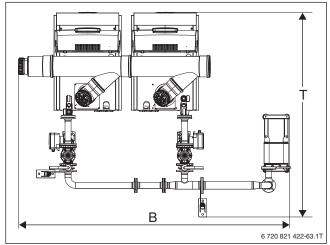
2-boiler cascade, installation side-by-side (dimensions → Table 30, page 79)
